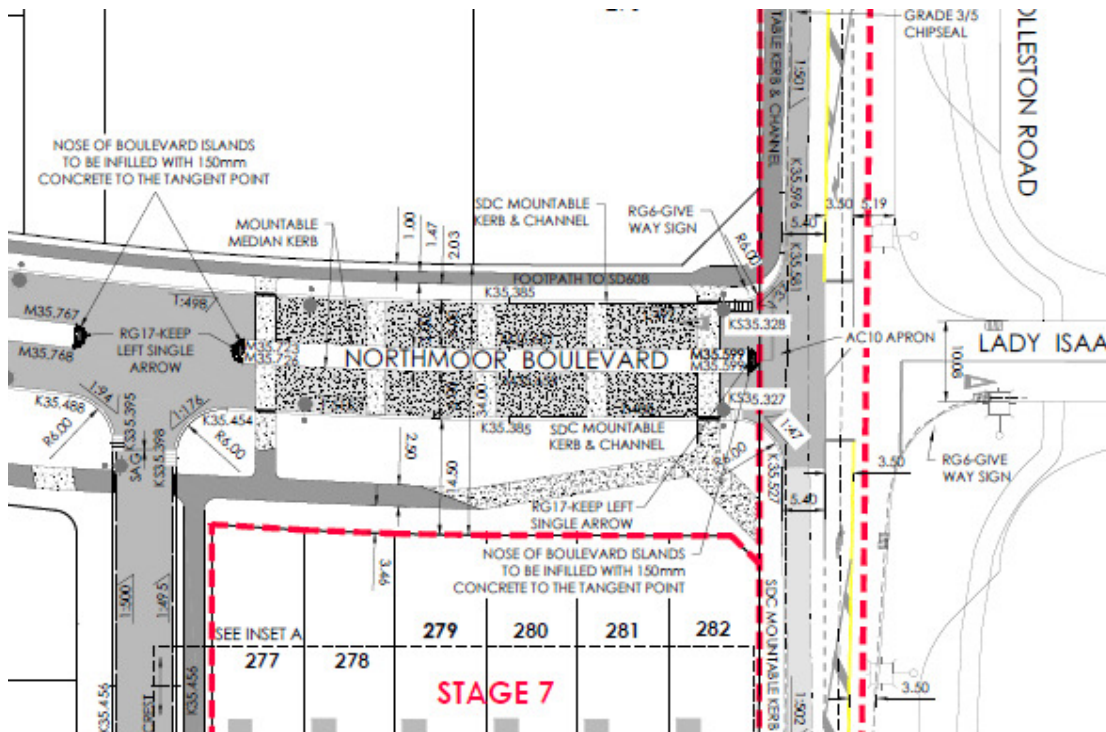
Northmoor Boulevard / Springston Rolleston Road / Lady Isaac Drive Intersection layout
